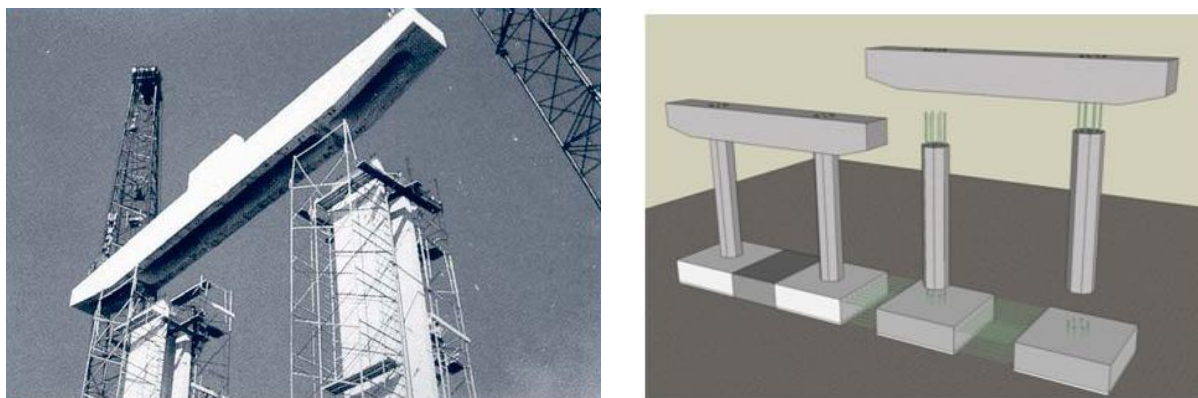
Examples of prefabricated bridge piers. Figure courtesy of FHWA (<https://www.fhwa.dot.gov/bridge/prefab/facts.cfm>)
